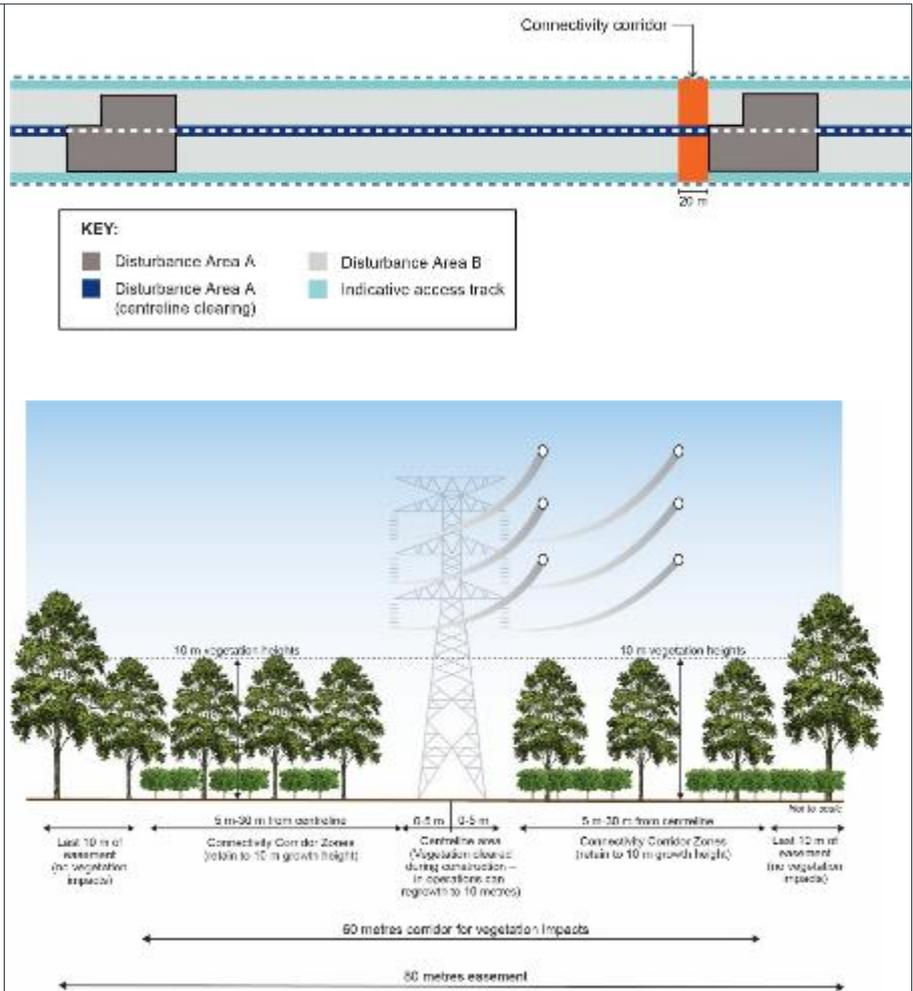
Indicative plan view (top) and cross section of connectivity corridor (bottom)
